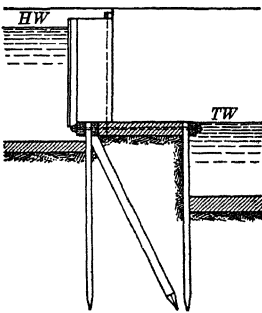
Development of sill with sheet piling (for a mitering gate)
